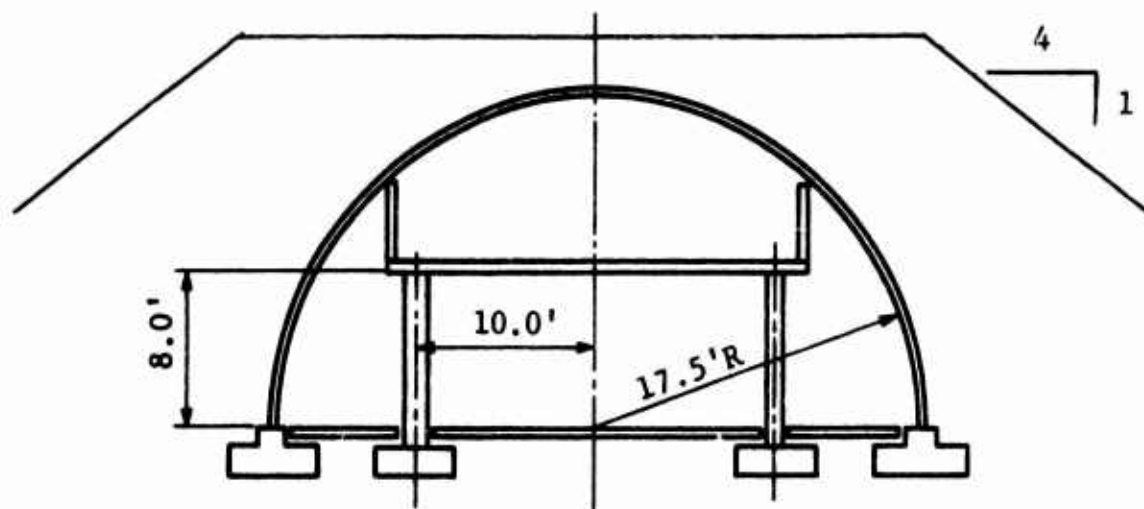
CROSS SECTION OF BASIC ARCH SHELTER
